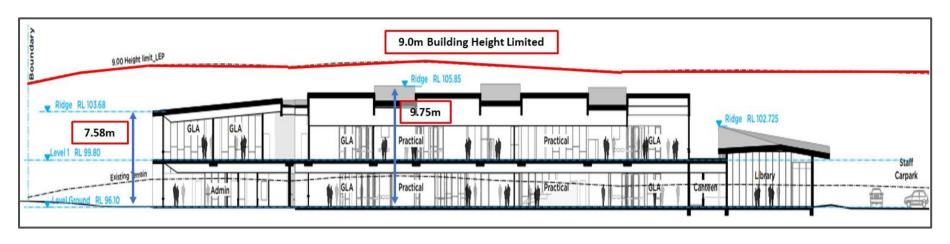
| Section through the north-south showing sections of the building within the stipulated 9m height limit (Source: Applicant's EIS 2018)
